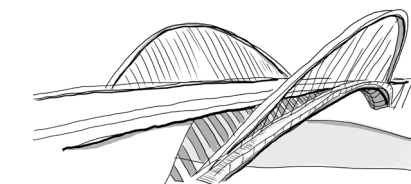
V: Bridge as form (adapted construction) by Calatrava
